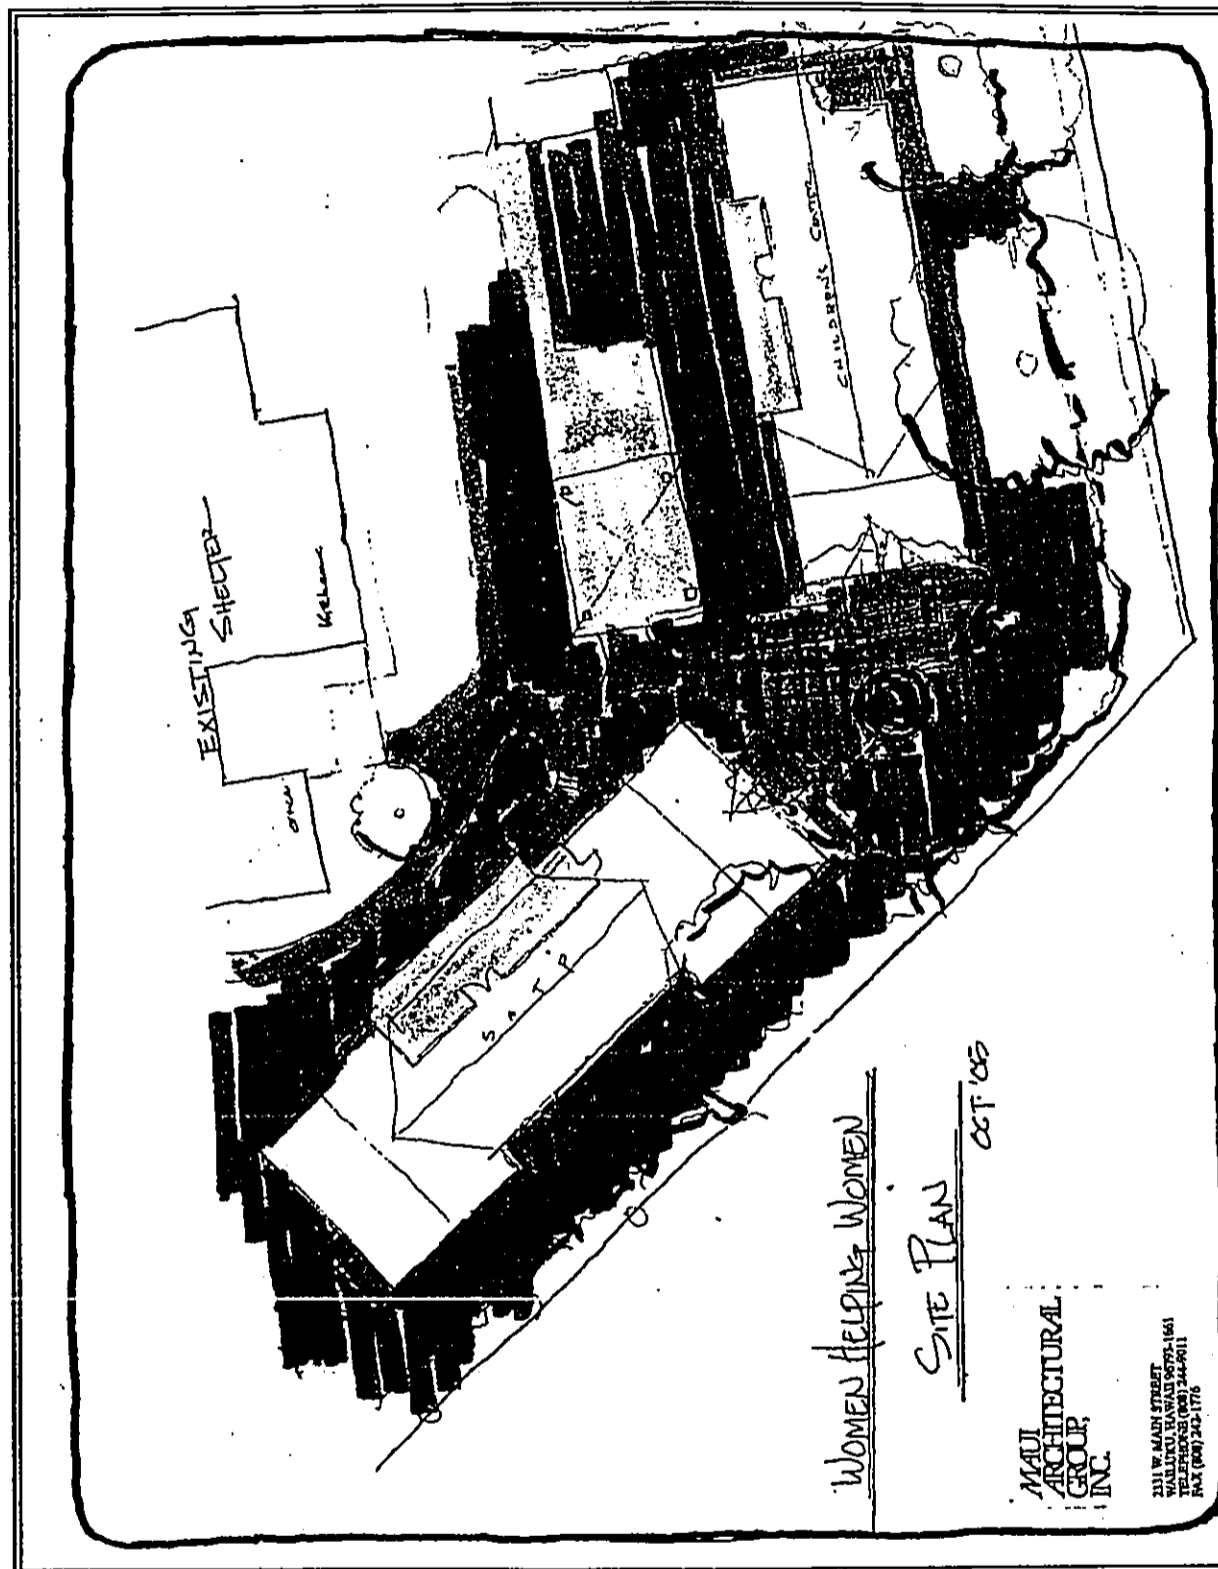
FIGURE II.d – Location of proposed Children's Center and Substance Abuse Shelter (STAP); for more detailed drawings please refer to Appendix D.
